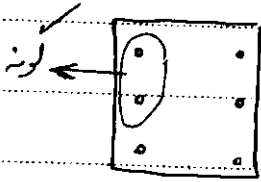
Skin reinforcement for beams and joists with $h > 900$ mm.
